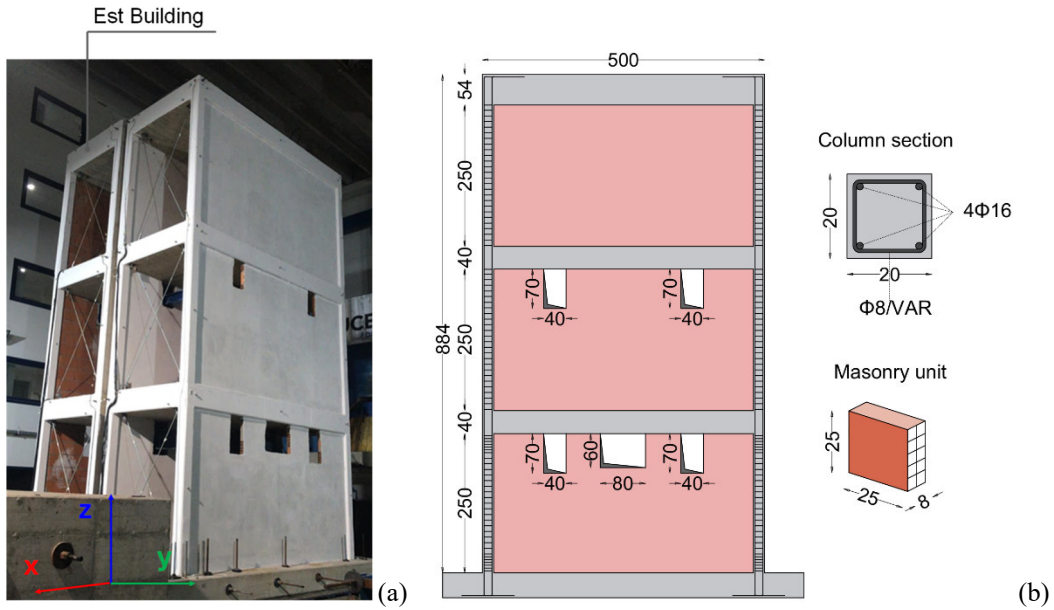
Details of the reference structure: (a) Full-scale twin buildings tested in the experimental campaign (Rebecchi et al., 2023); (b) Geometry, column reinforcement, and masonry typology (dimensions in cm).
